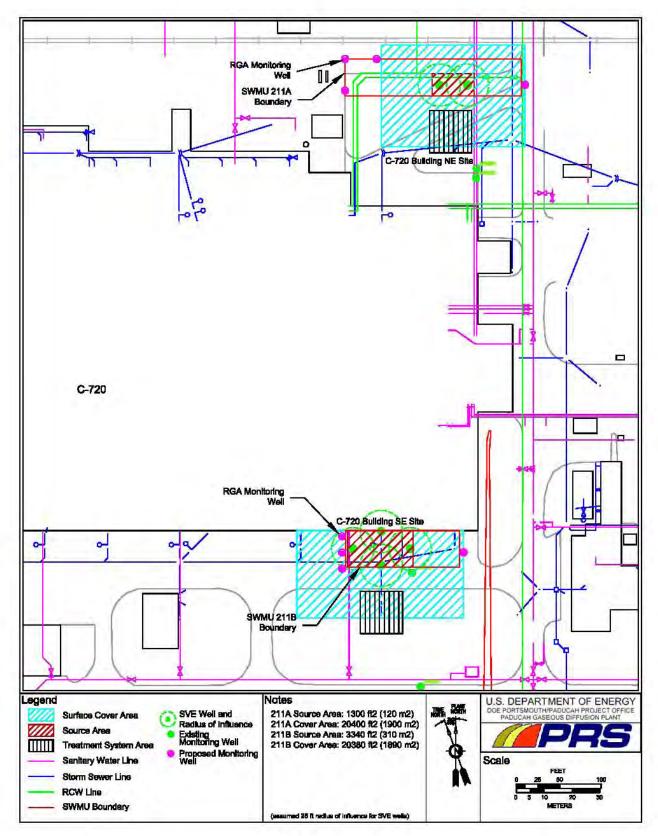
Plan View of Alternative 4 at C-720 Northeast and Southeast Sites
